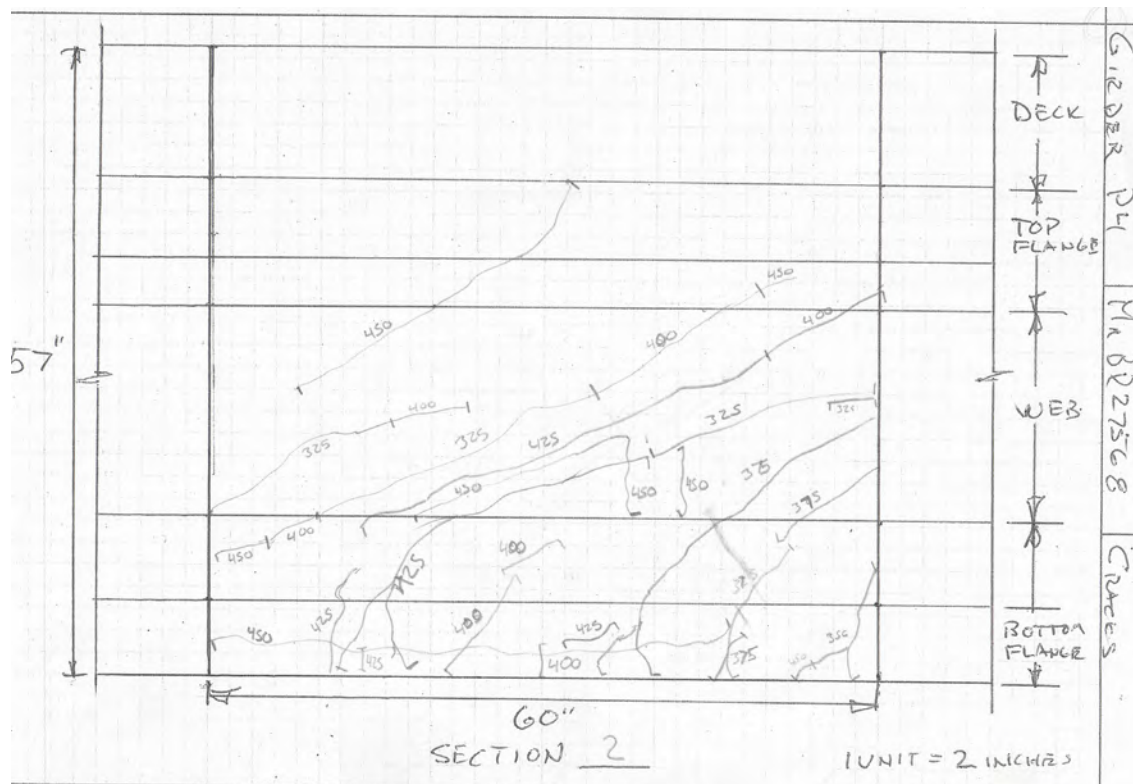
Girder P4 crack pattern – Section 2
